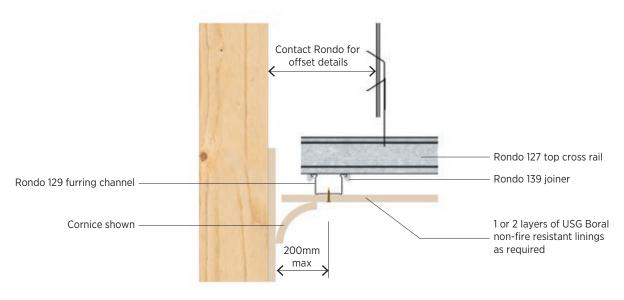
Typical Perimeter Detail – Section Through Furring Channel
